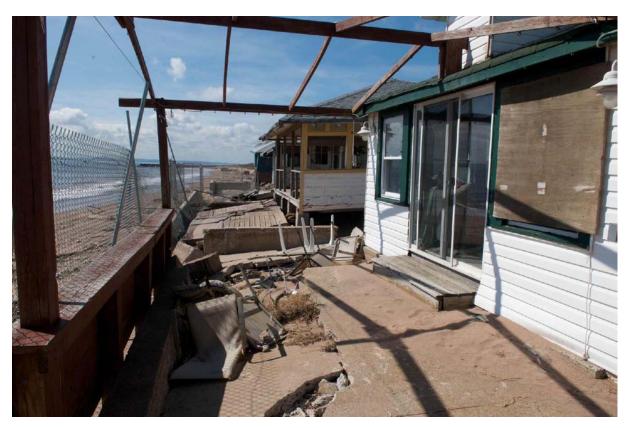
View of damaged bungalows looking south along Cedar Grove Beach.
